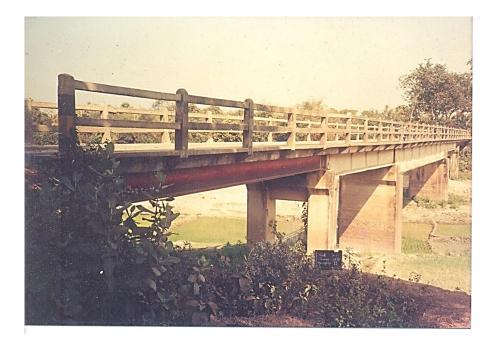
A composite steel girder bride at Dhaka-Tangail Highway.
